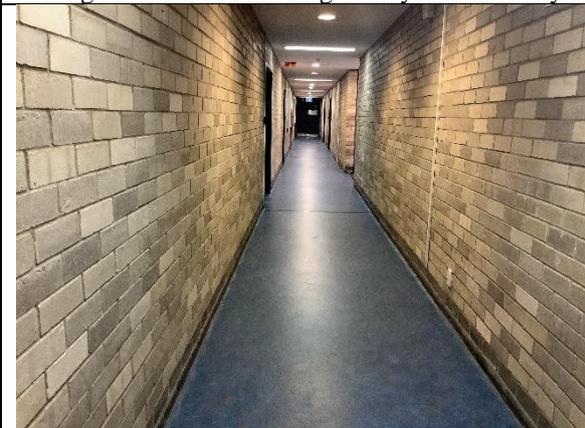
Building C – C.G.19 – Throughout – Floor Covering – Vinyl Sheet – Hessian Backed - Blue
